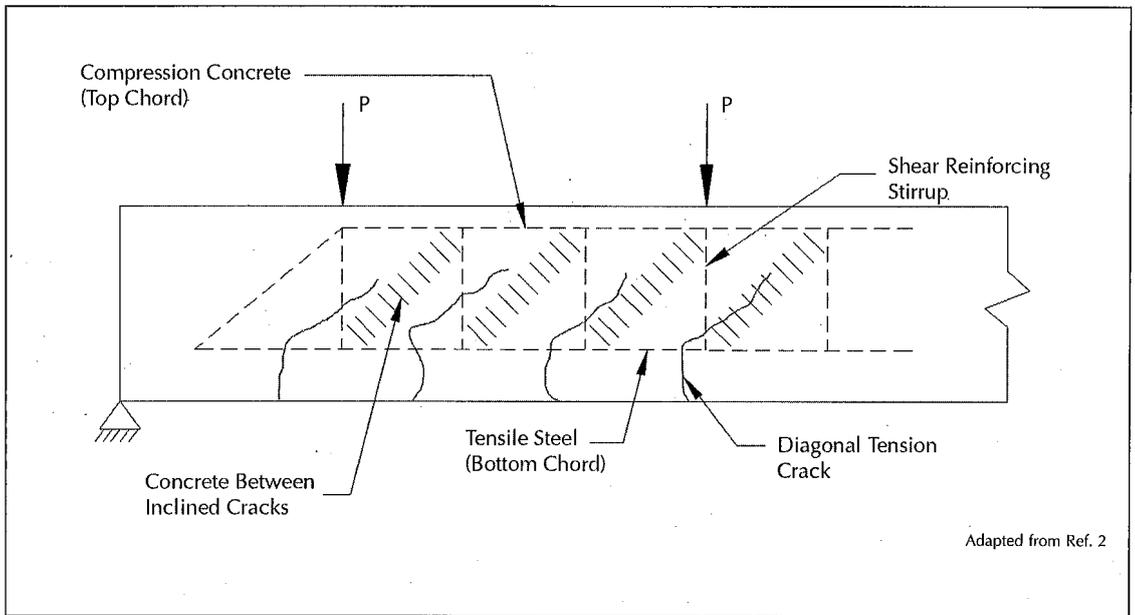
Truss model of axial shear forces in a reinforced concrete beam.
